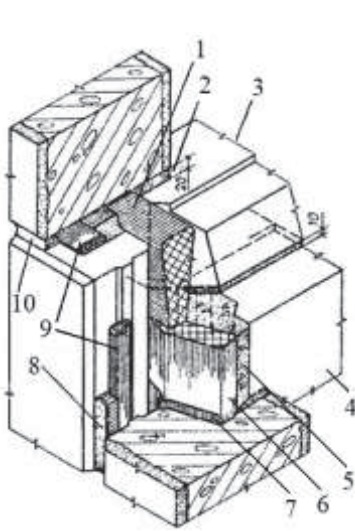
Closed joint: 1 - horizontal thermal liner; 2 - the seam is filled with cement mortar 20 mm; 3 - reinforced concrete floor slab; 4 - reinforced concrete panel of the inner wall; 5 - concrete M150-200; 6 - vertical thermal liner; 7 - air protection gluing; 8 - elastic gasket; 9 - sealing mastic; 10 - protective coating
